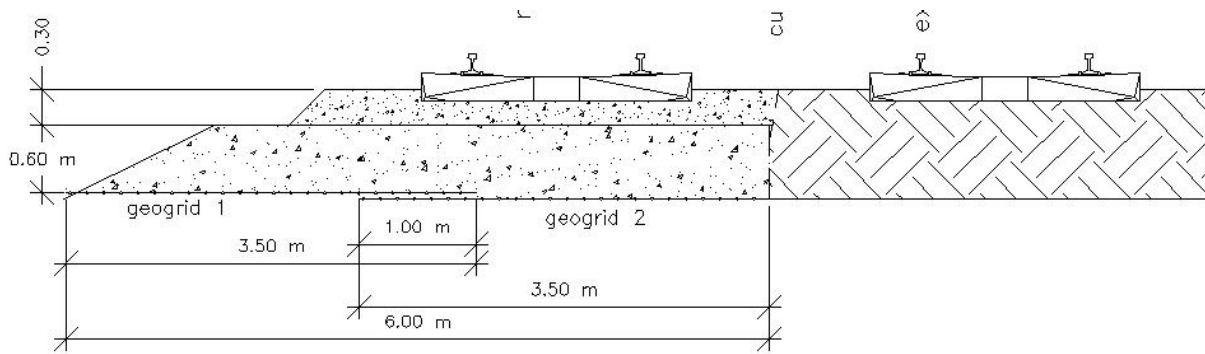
Celje – Slovenia railways cross-section with single layer geogrid and geotextile
